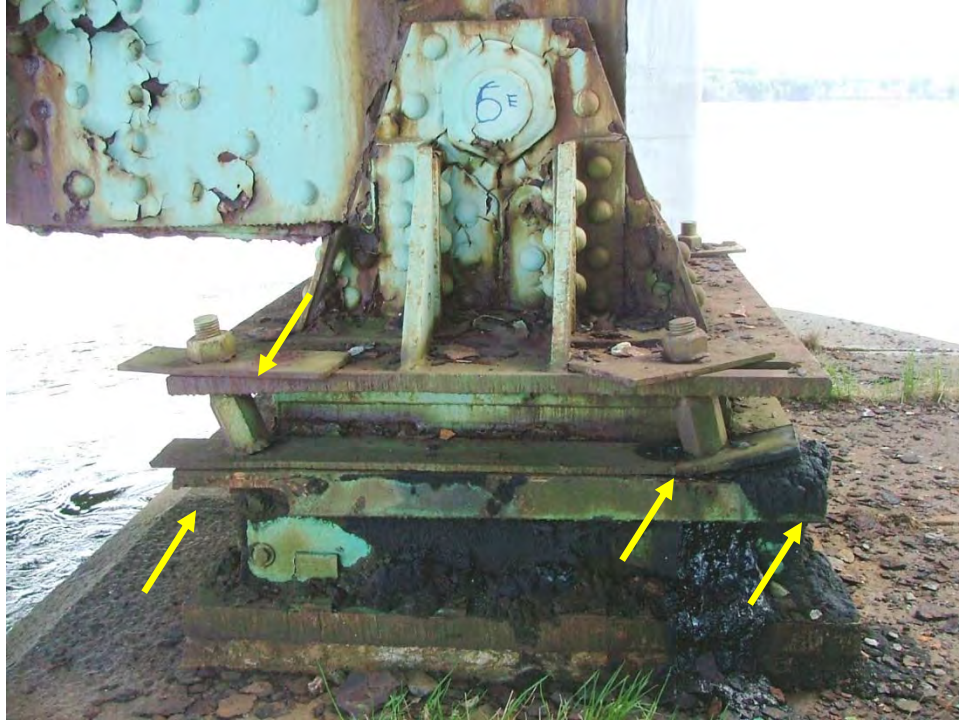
Pier 6, east expansion bearing adjacent to Span 6. Bearings are overextended resulting in anchor bolt failure and damaged bearing shroud. Similar conditions exist at Pier 3.
